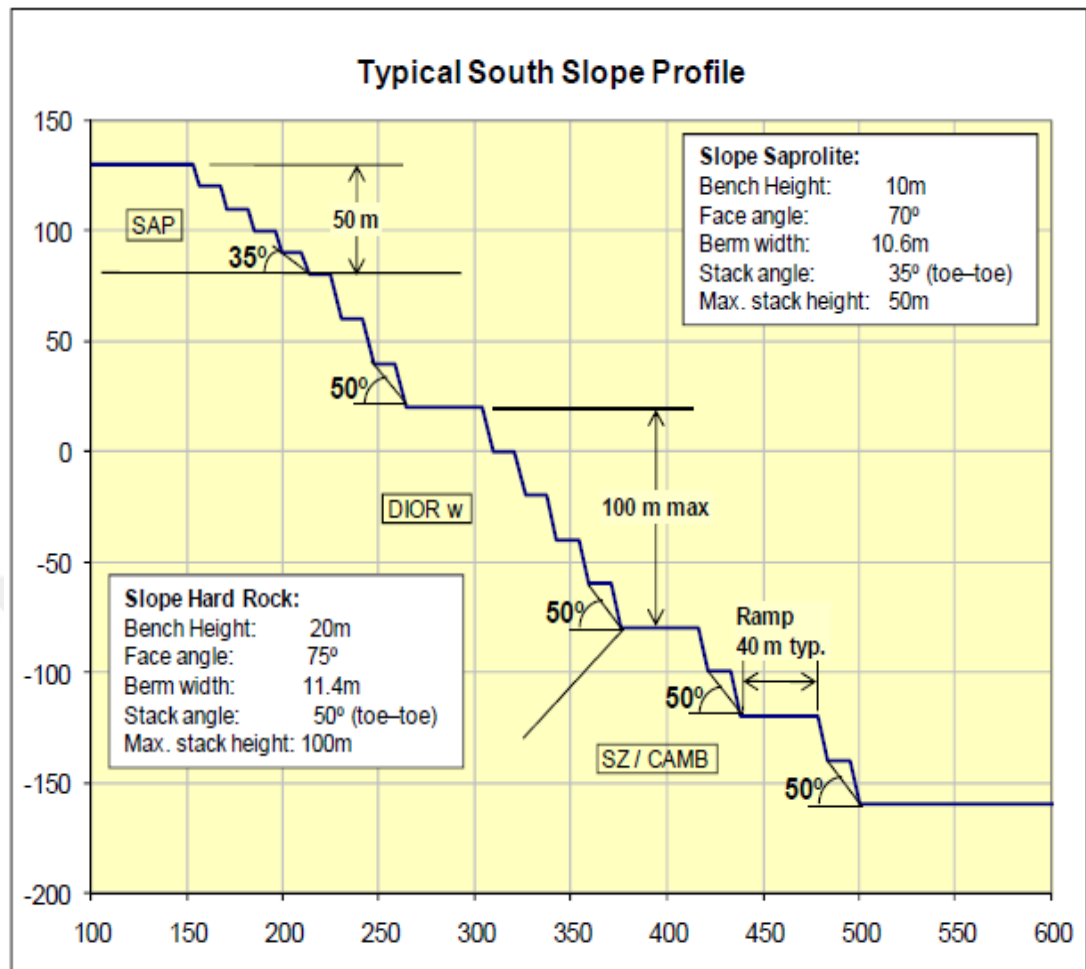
Typical south slope profile with recommended slope angles (SRK, 2009)
